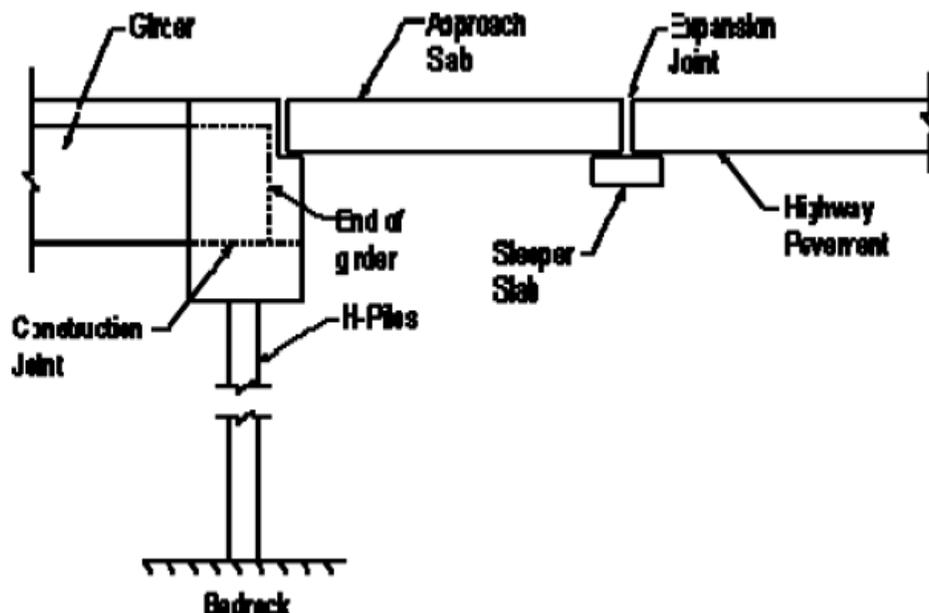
Schematic of an Integral Abutment System with Sleeper Slab [14].
